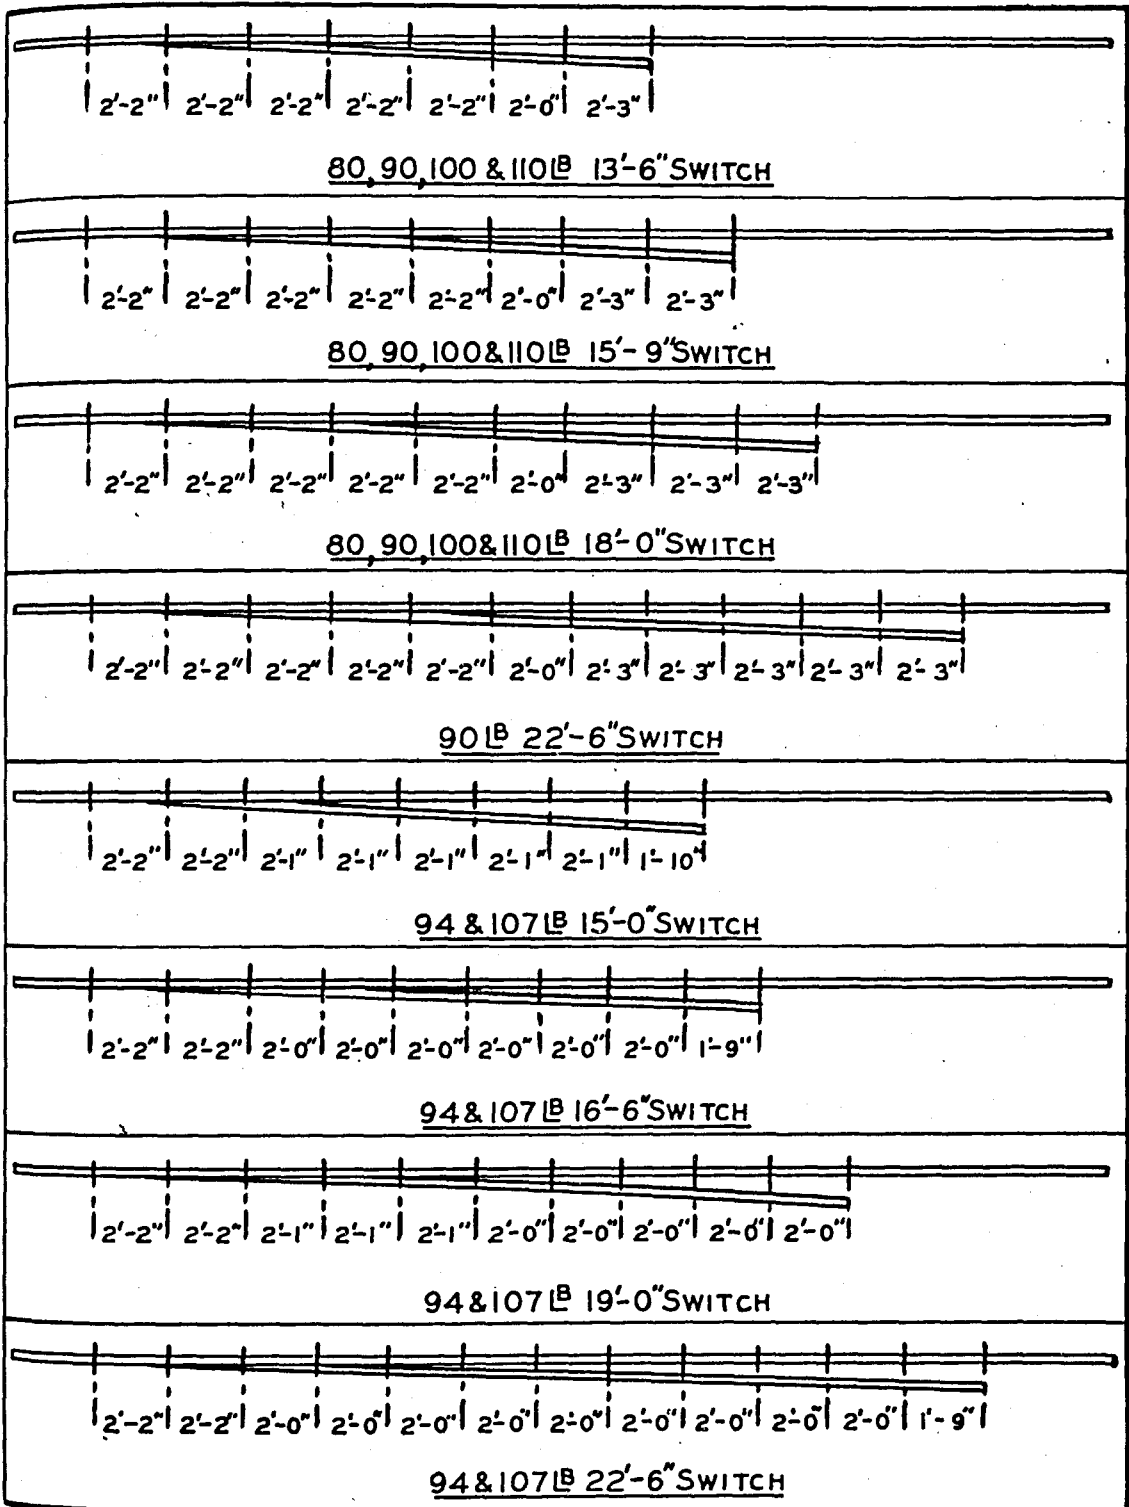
SPACING OF CHAIR BOLTS, Y LAYOUT, STOCK RAILS
